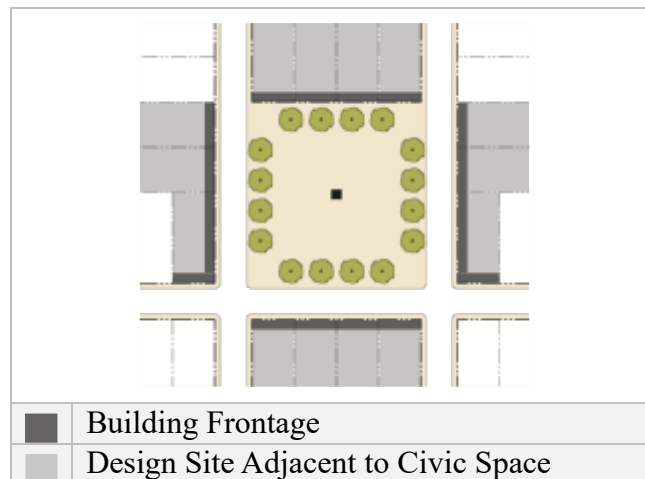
Building Frontage Adjacent to a Civic Space
